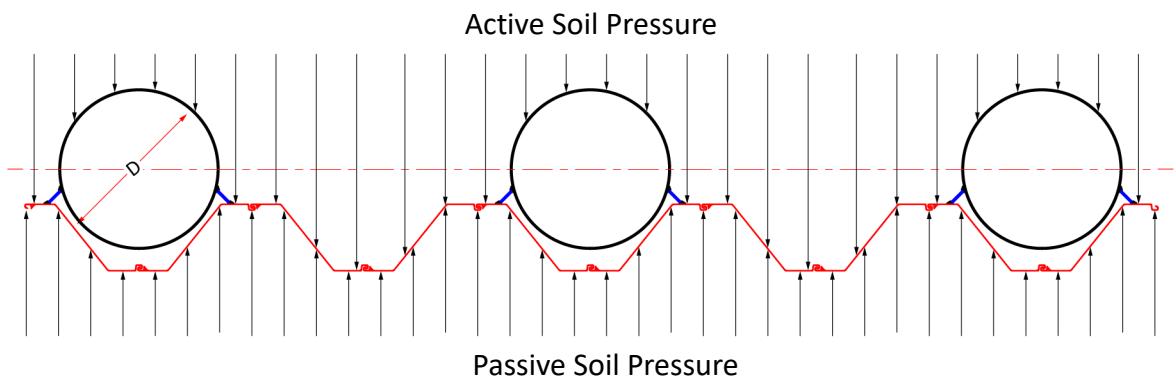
(c). Earth pressure diagram - Plan in section E-E (Pattern B, above SSP toe level)
